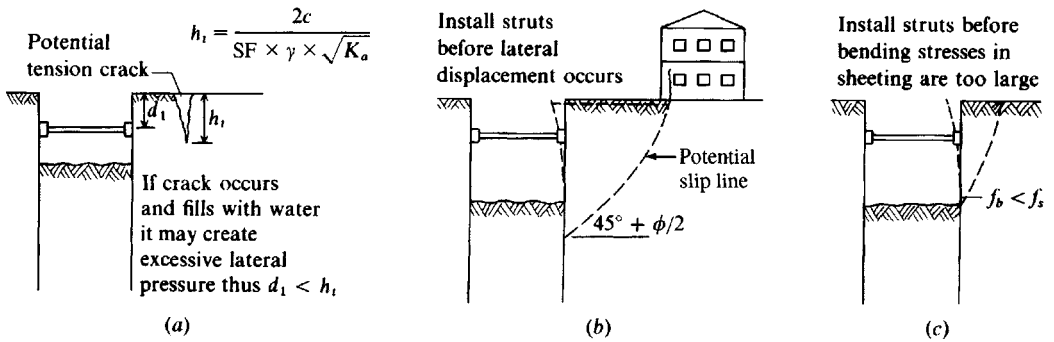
Depth of first wale and struts (or rakers) in a braced wall system.
